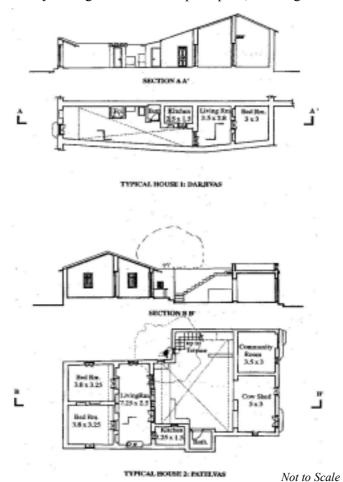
Typical traditional house plans – village Modpar Source: Vastushilpa foundation and Mc. Gill University, Montreal 2001
